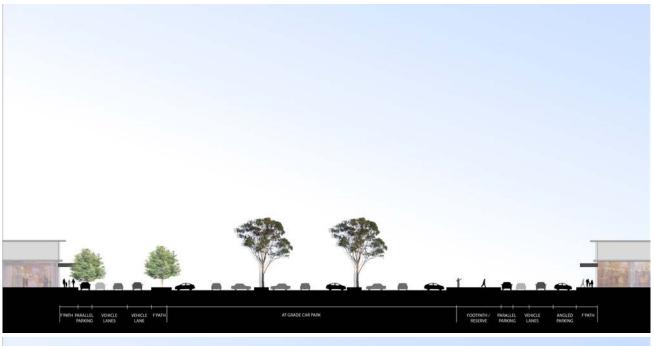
Kingsway Cross Section D - D' (Typical treatment from Coleman Parade and Railway Parade North)
